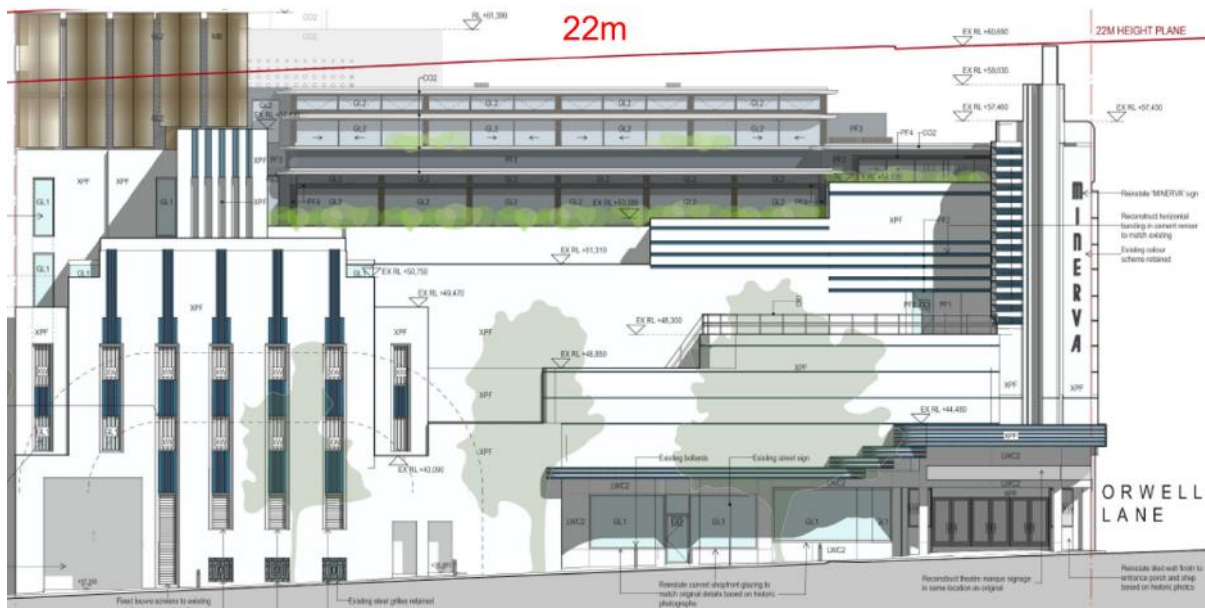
The height limit (shown as a red line) as viewed from the Orwell Street elevation
